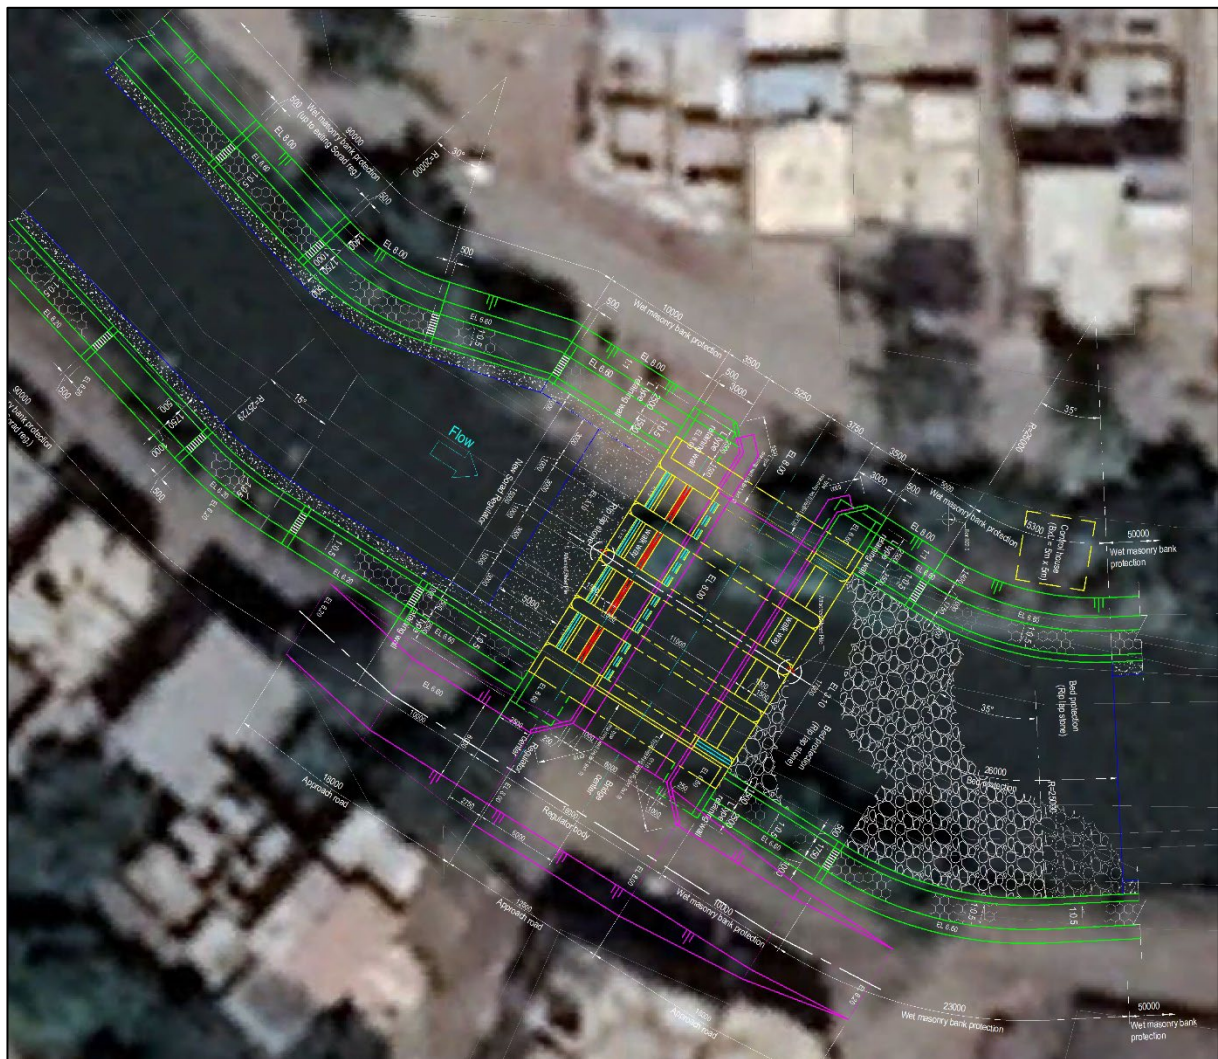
Plan of New Sorad Regulator (New Construction)
